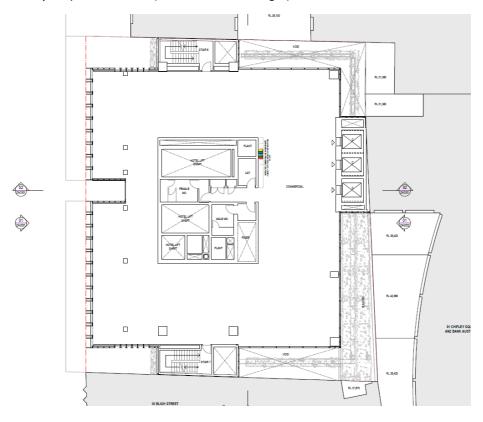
| Proposed levels 3-9 (Source: Woods Bagot)
